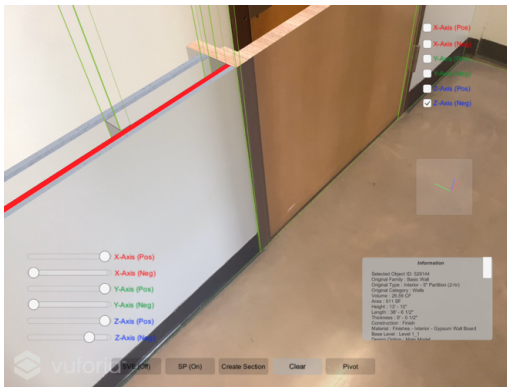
Drywall and door section views and BIM metadata retrieval of internal layers in BIMxAR.
